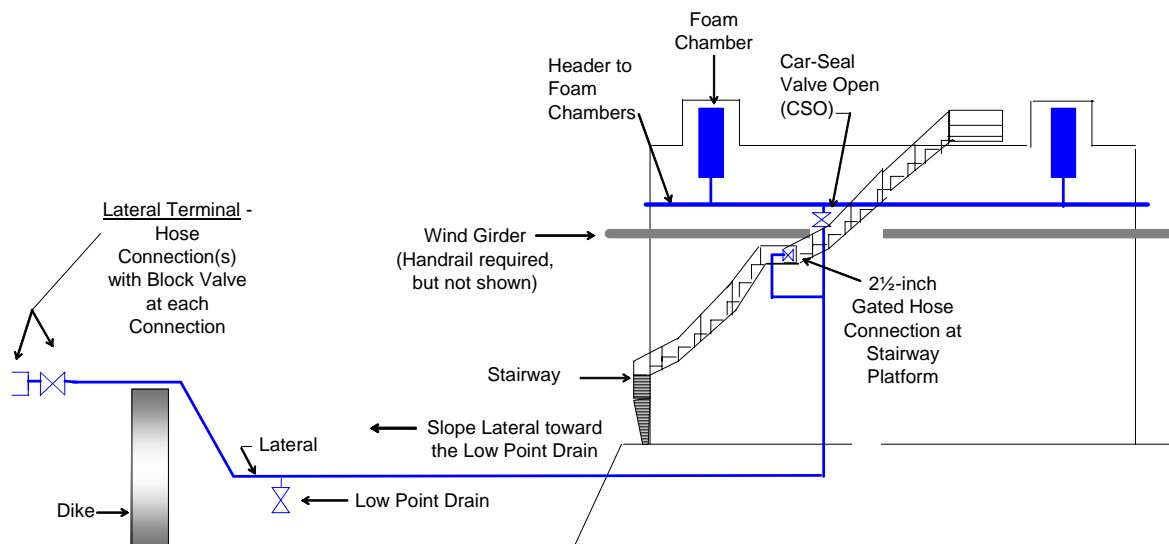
Layout of Supply Piping to 2 1/2-Inch Hose Connections and Multiple Foam Makers
